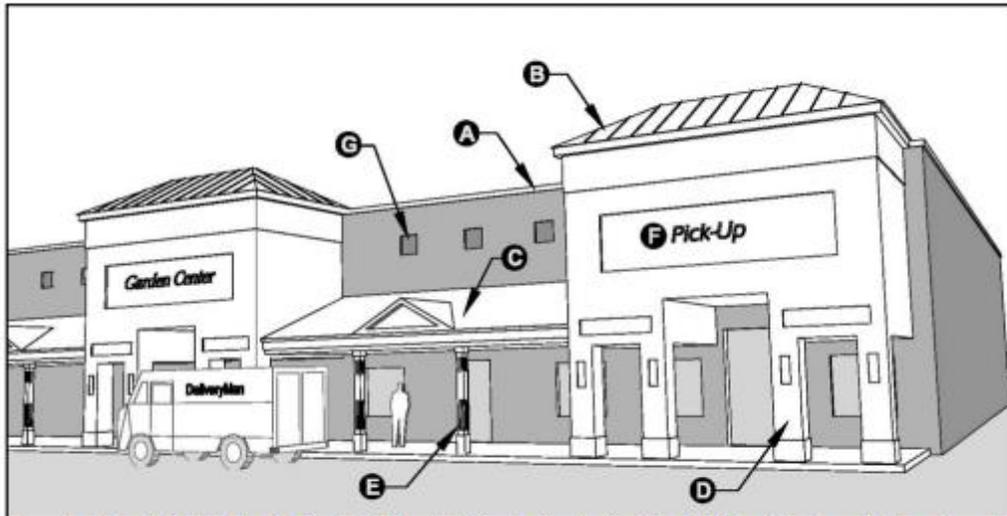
Alternate Design For Big-Box Retail. By articulating the façade of a typical Big Box retail store with different massing elements, you can help to give a smaller scale appearance to an otherwise featureless mass.
